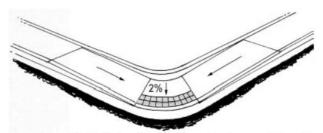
On narrow sidewalks with tight turning radii, a single parallel curb ramp may be considered.
